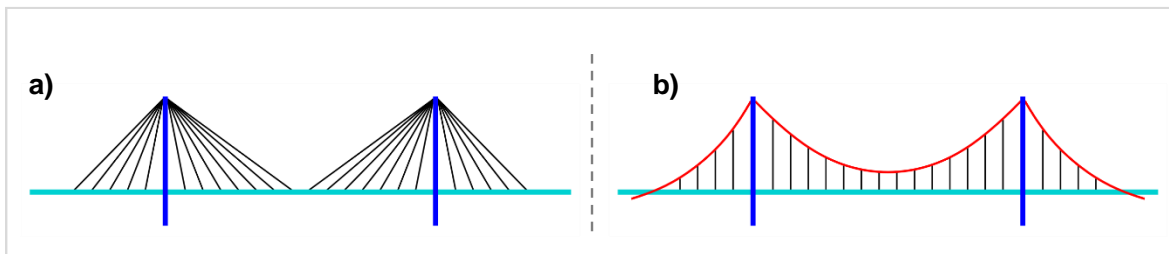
a) Cable-stayed bridge with fan design; b) Suspension bridge. Source: Media.
